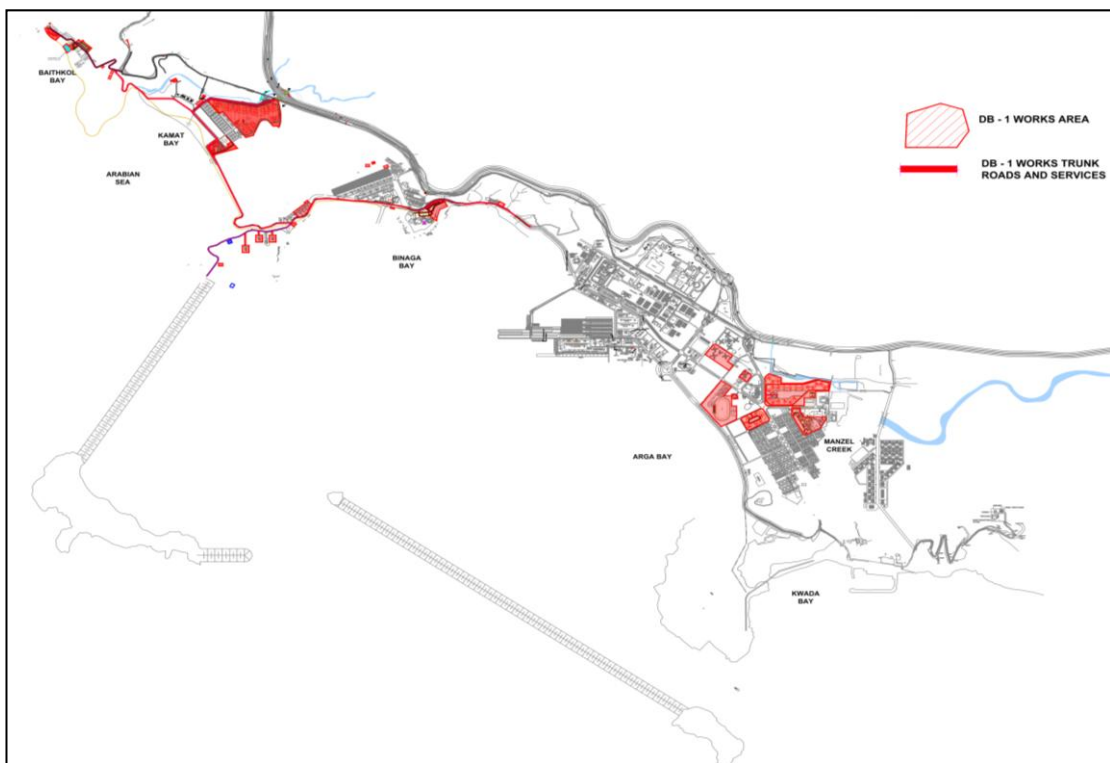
SCHEMATIC PLAN OF SITE A, HIGHLIGHTED RESIDENTIAL SITES UNDER DB-01
